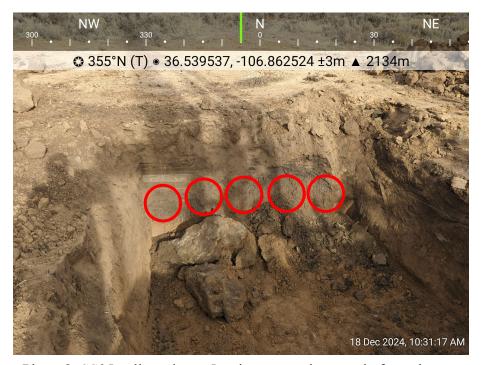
SS05 collected as a 5-point composite sample from the north sidewall of wellhead excavation area.
